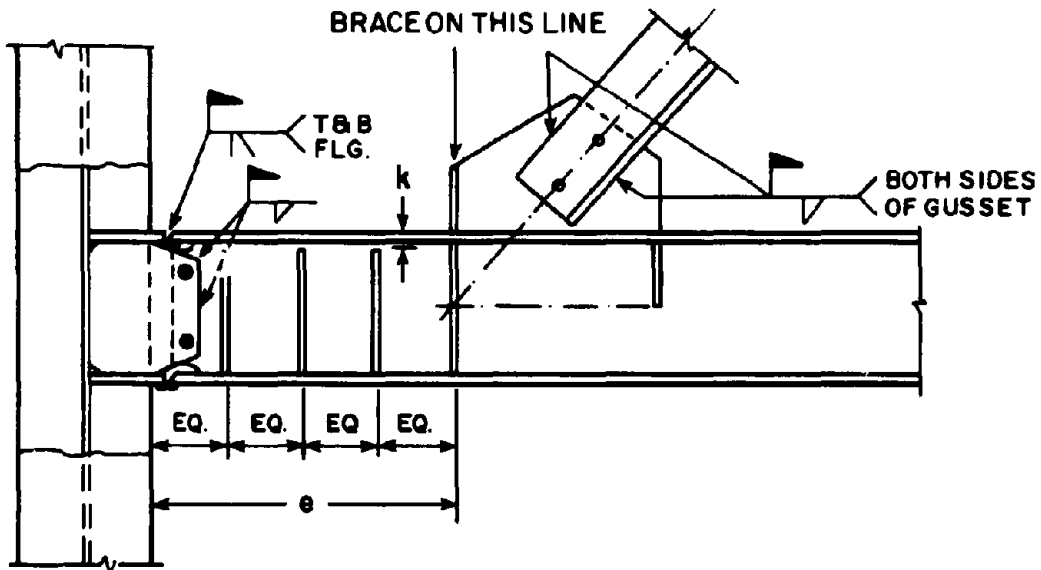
Suggested All-Welded Link-Column Web Connection Showing Suggested Stiffener Spacing.
